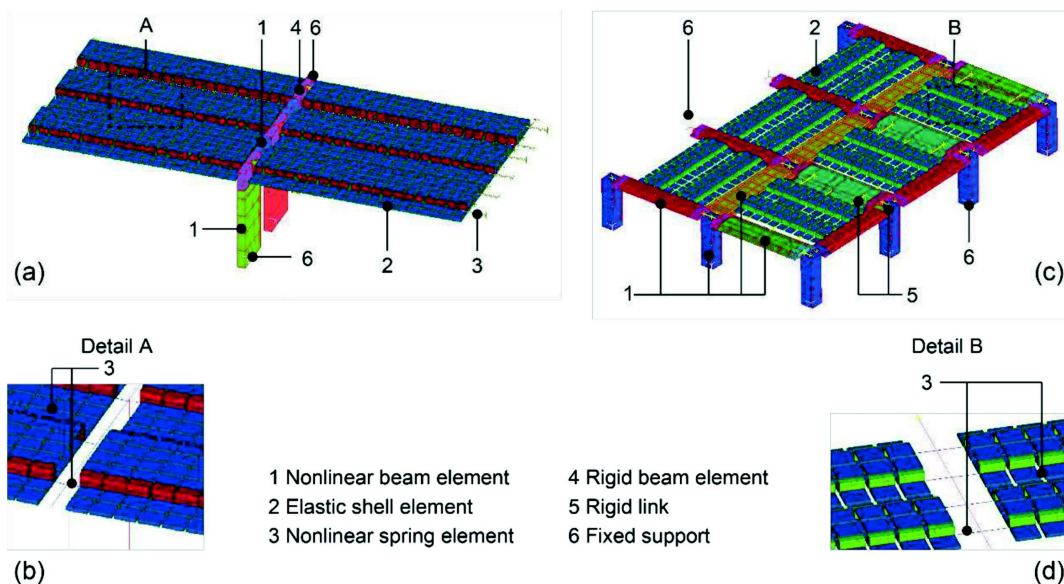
| Numerical models: (a) picture of the wall system model (ground floor), (b) element details of the wall system model, (c) picture of the coupled wall-frame system model (ground floor), and (d) element details of the coupled wall-frame system model.
